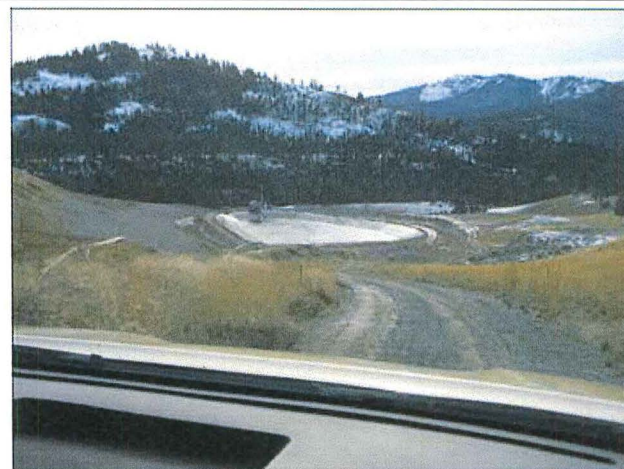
Reclaim water pond for tailings impoundment. When in operation, the water from this pond is re-used in the milling process.
